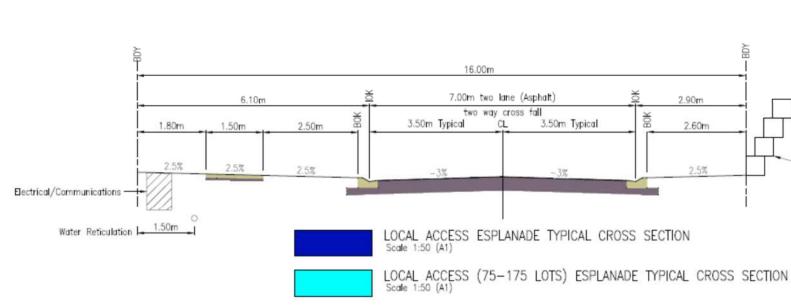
Proposed Local Access Esplanade Road Typical Cross Section
